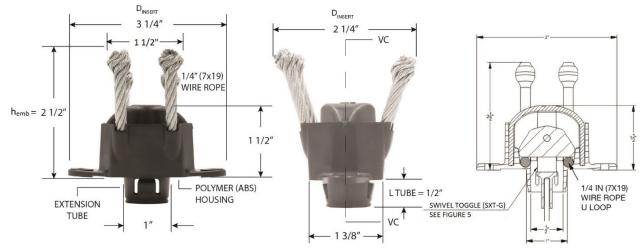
B-SPIDER SX-WF WITH THREADED ROD ADAPTER (SX-ADP) INSERT ASSEMBLY
